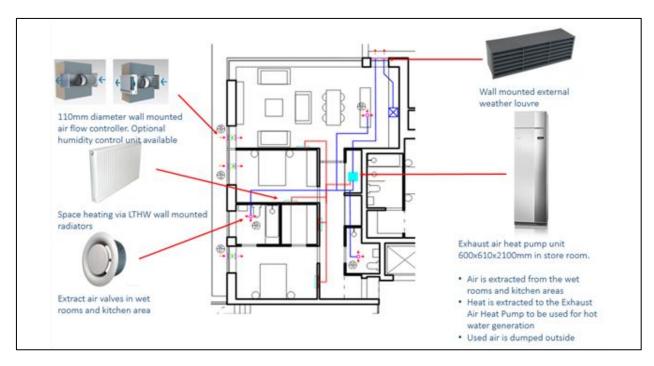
Example Diagram of Typical Exhaust Air Heat Pump Layout
